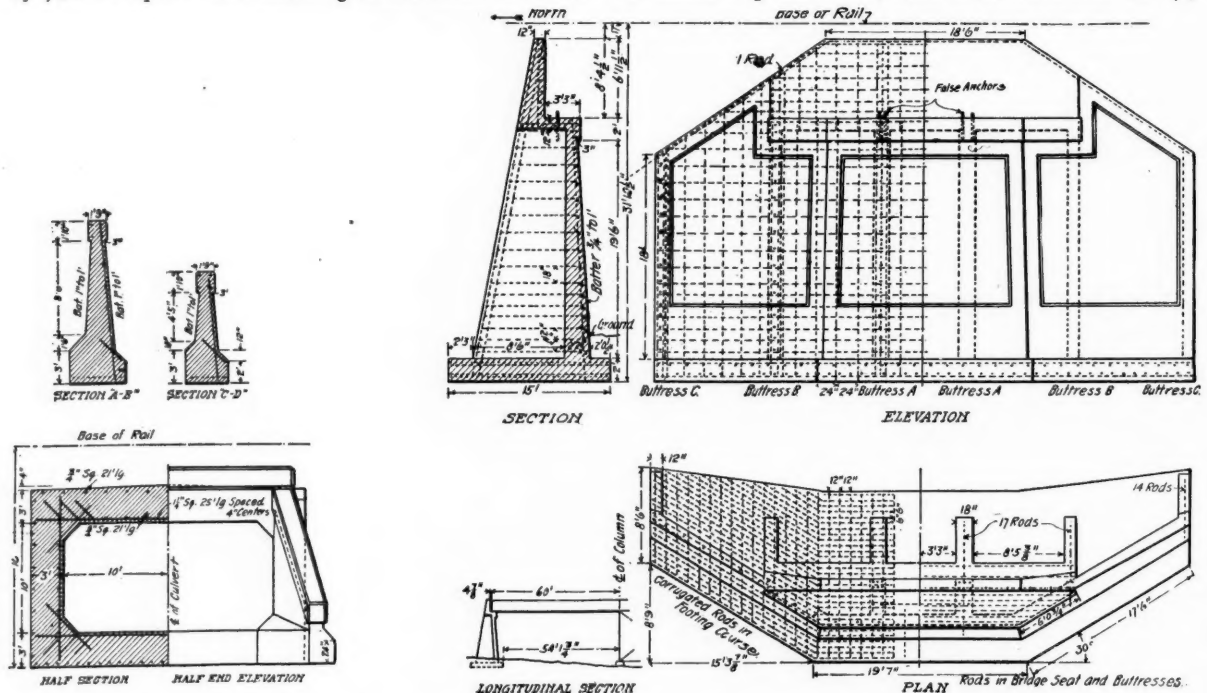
ELEVATION AND SECTIONAL VIEW OF REINFORCED BOX CULVERT, WABASH R. R.
